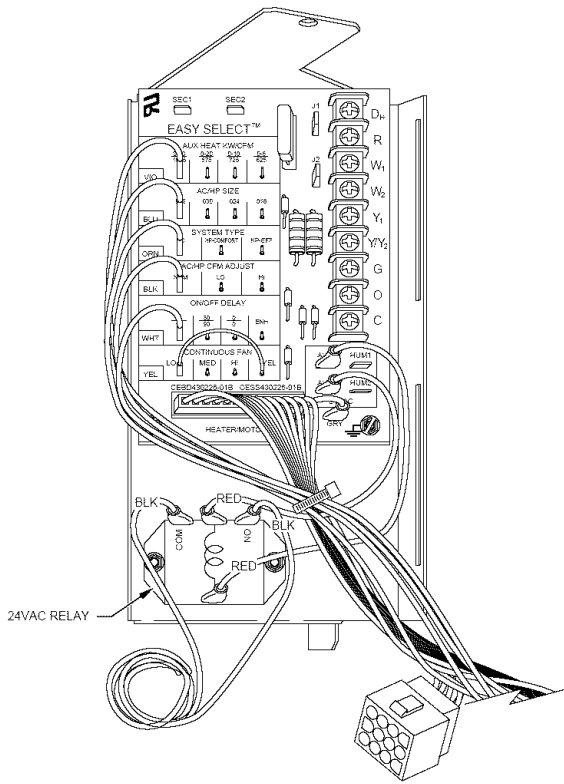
PCB Mounted with Wiring and Accessory Air Cleaner Relay
